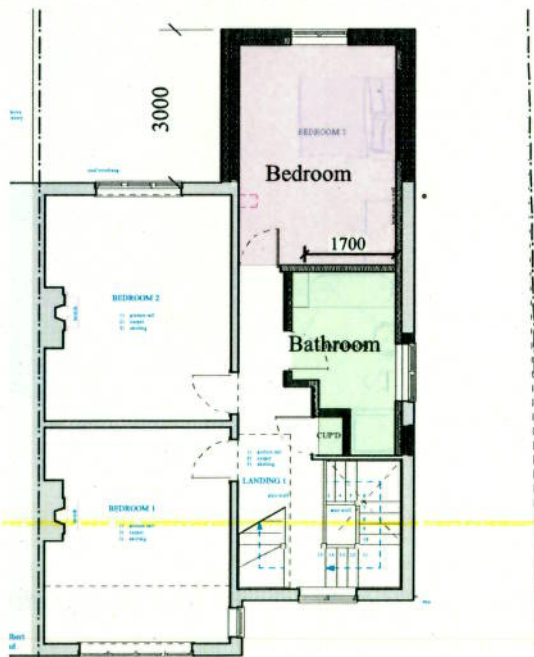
Alternative first floor plan with a larger two-storey extension showing how the first floor could be extended within permitted development rights
